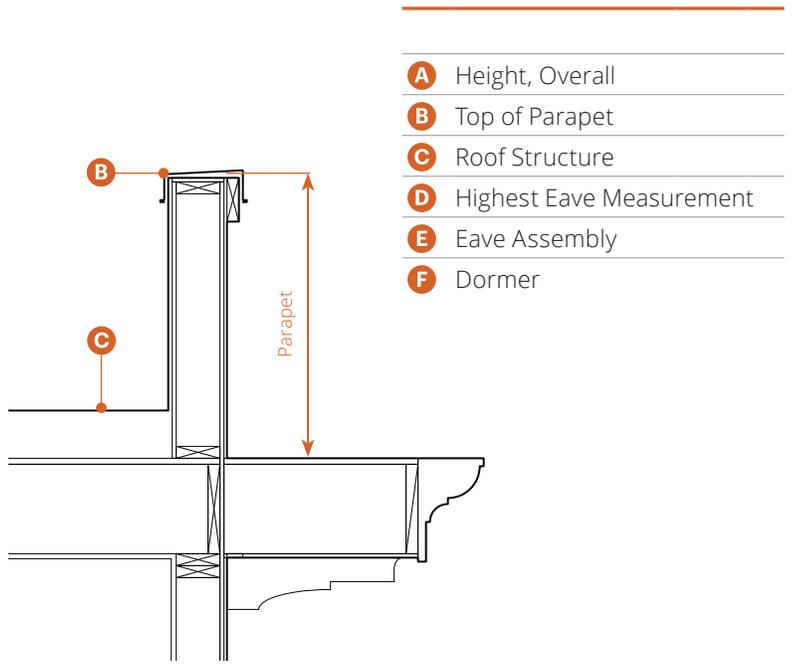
Section Detail of Top of Parapet and Flat Roof
